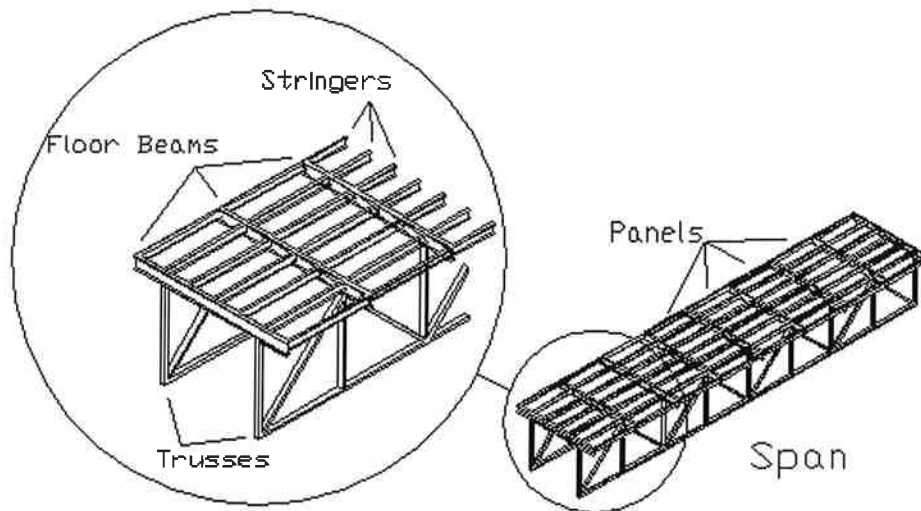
Diagram of one span of the southbound structure of the Winchester Bridge without the six inch concrete deck.
